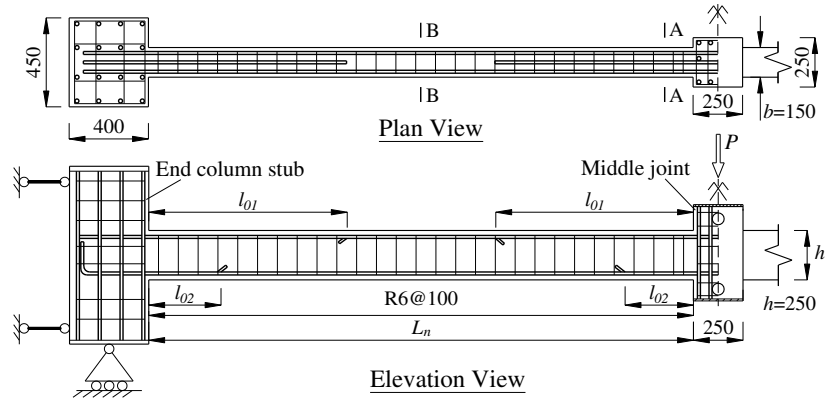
Detailing and boundary conditions of specimens (Unit: mm)
